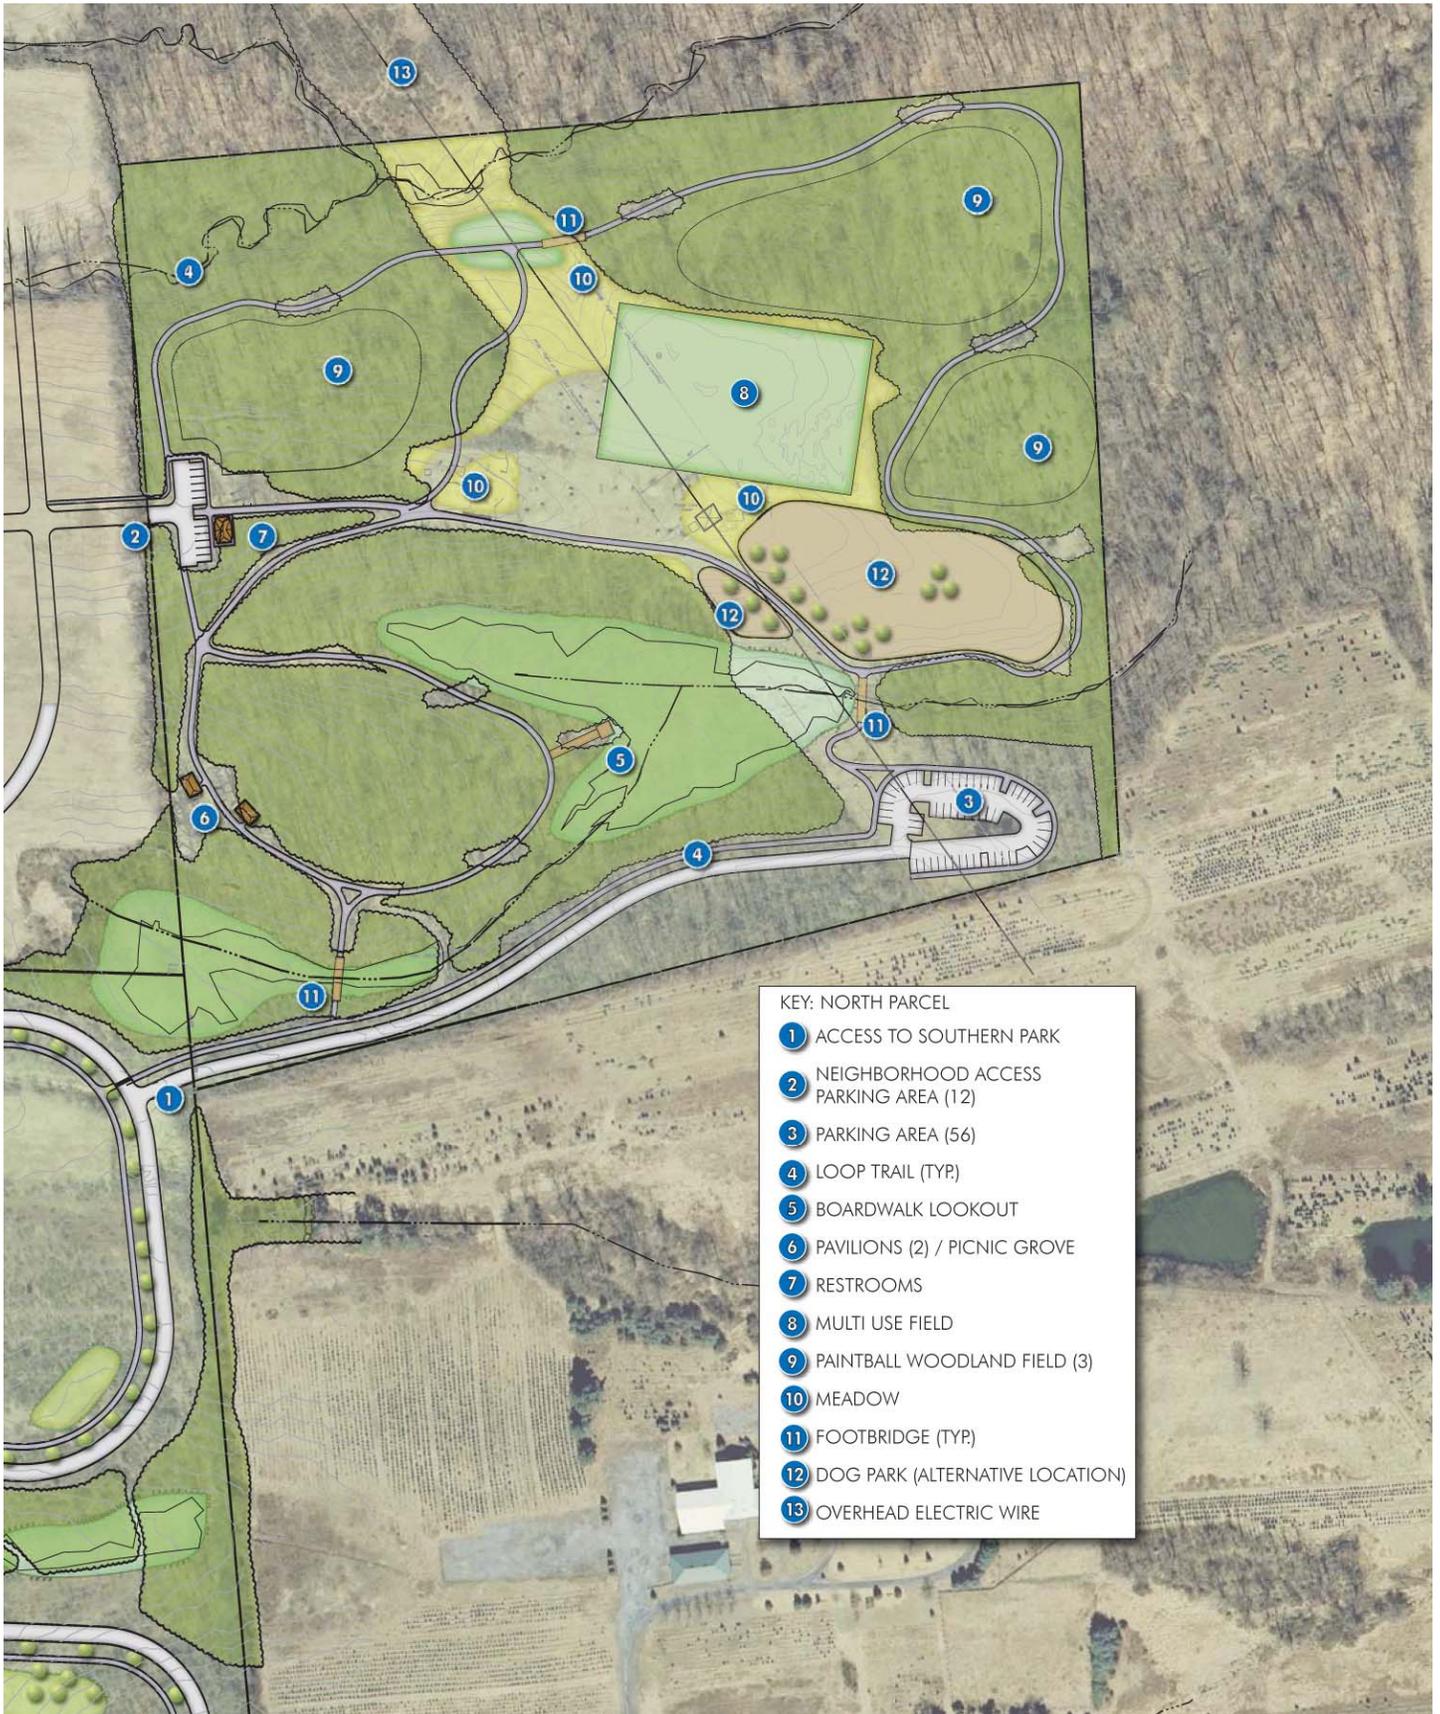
Wolfersberger Park Preferred Plan North (See appendix for enlarged plans)
